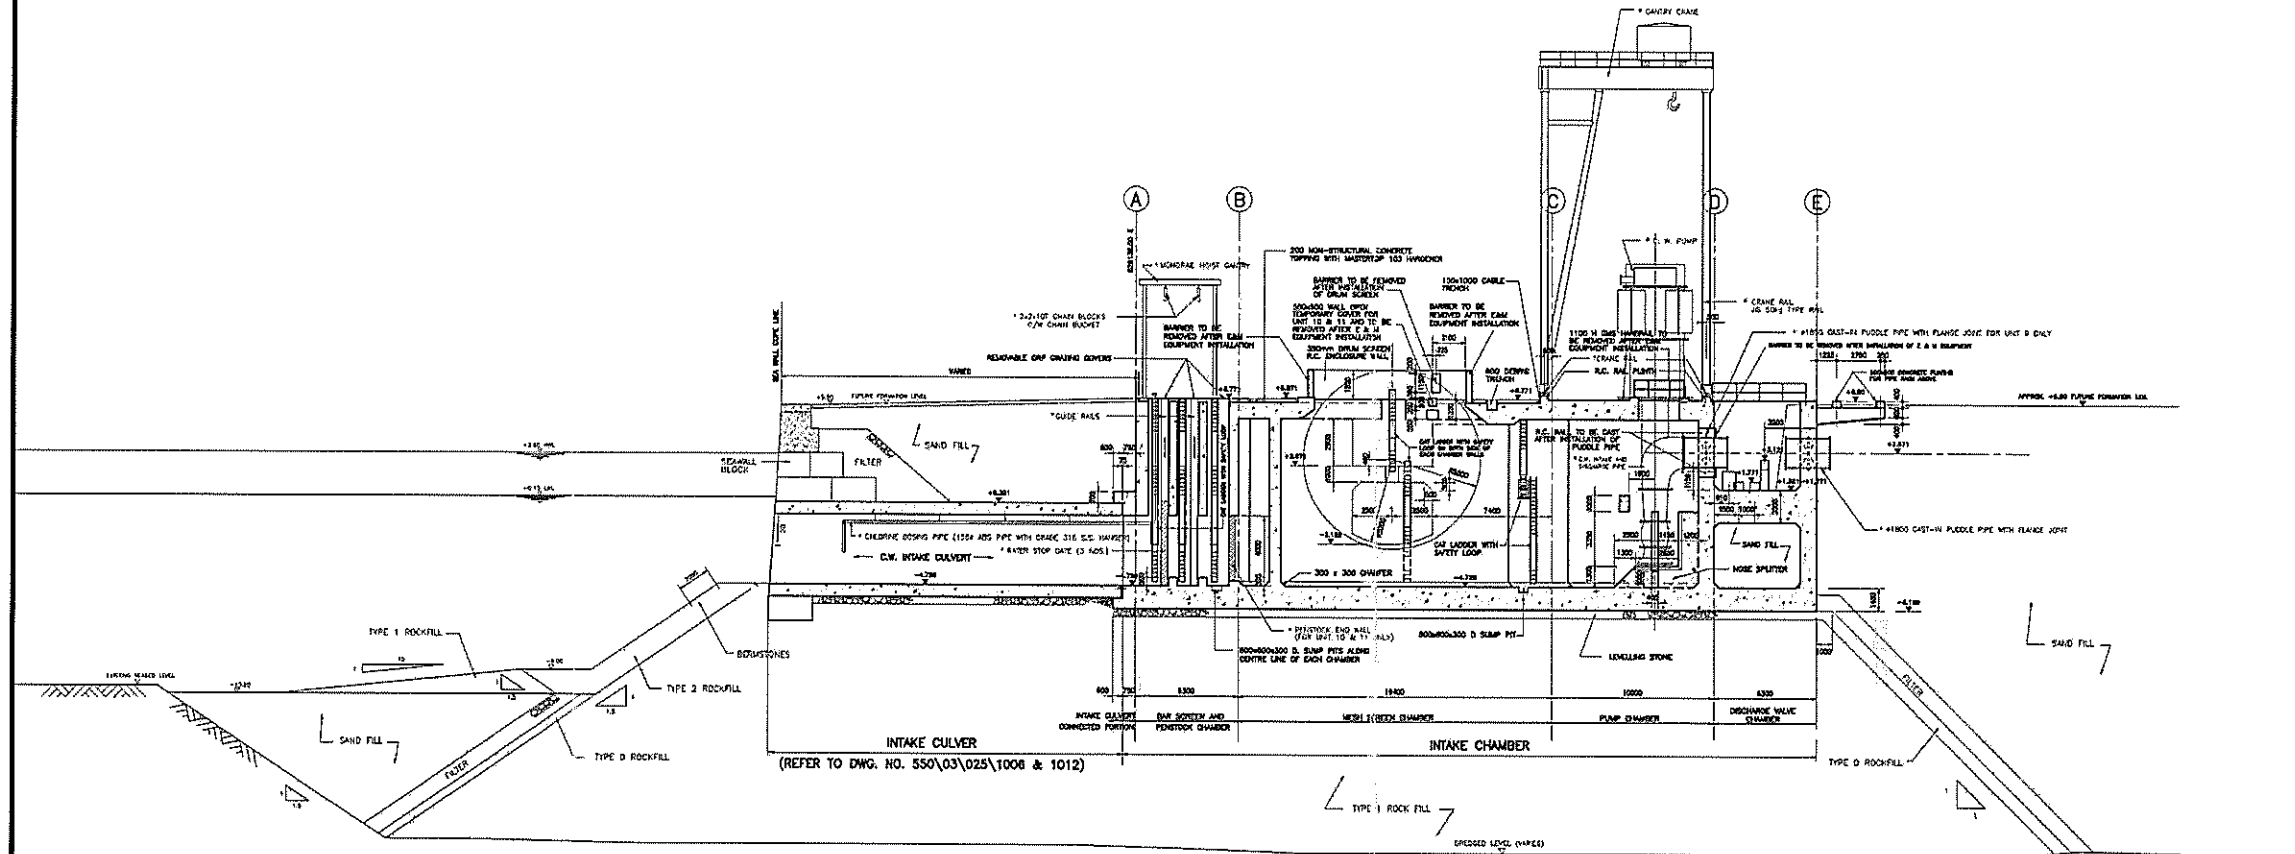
No.4 C.W. Intake - Intake Chamber General Arrangement Plan
